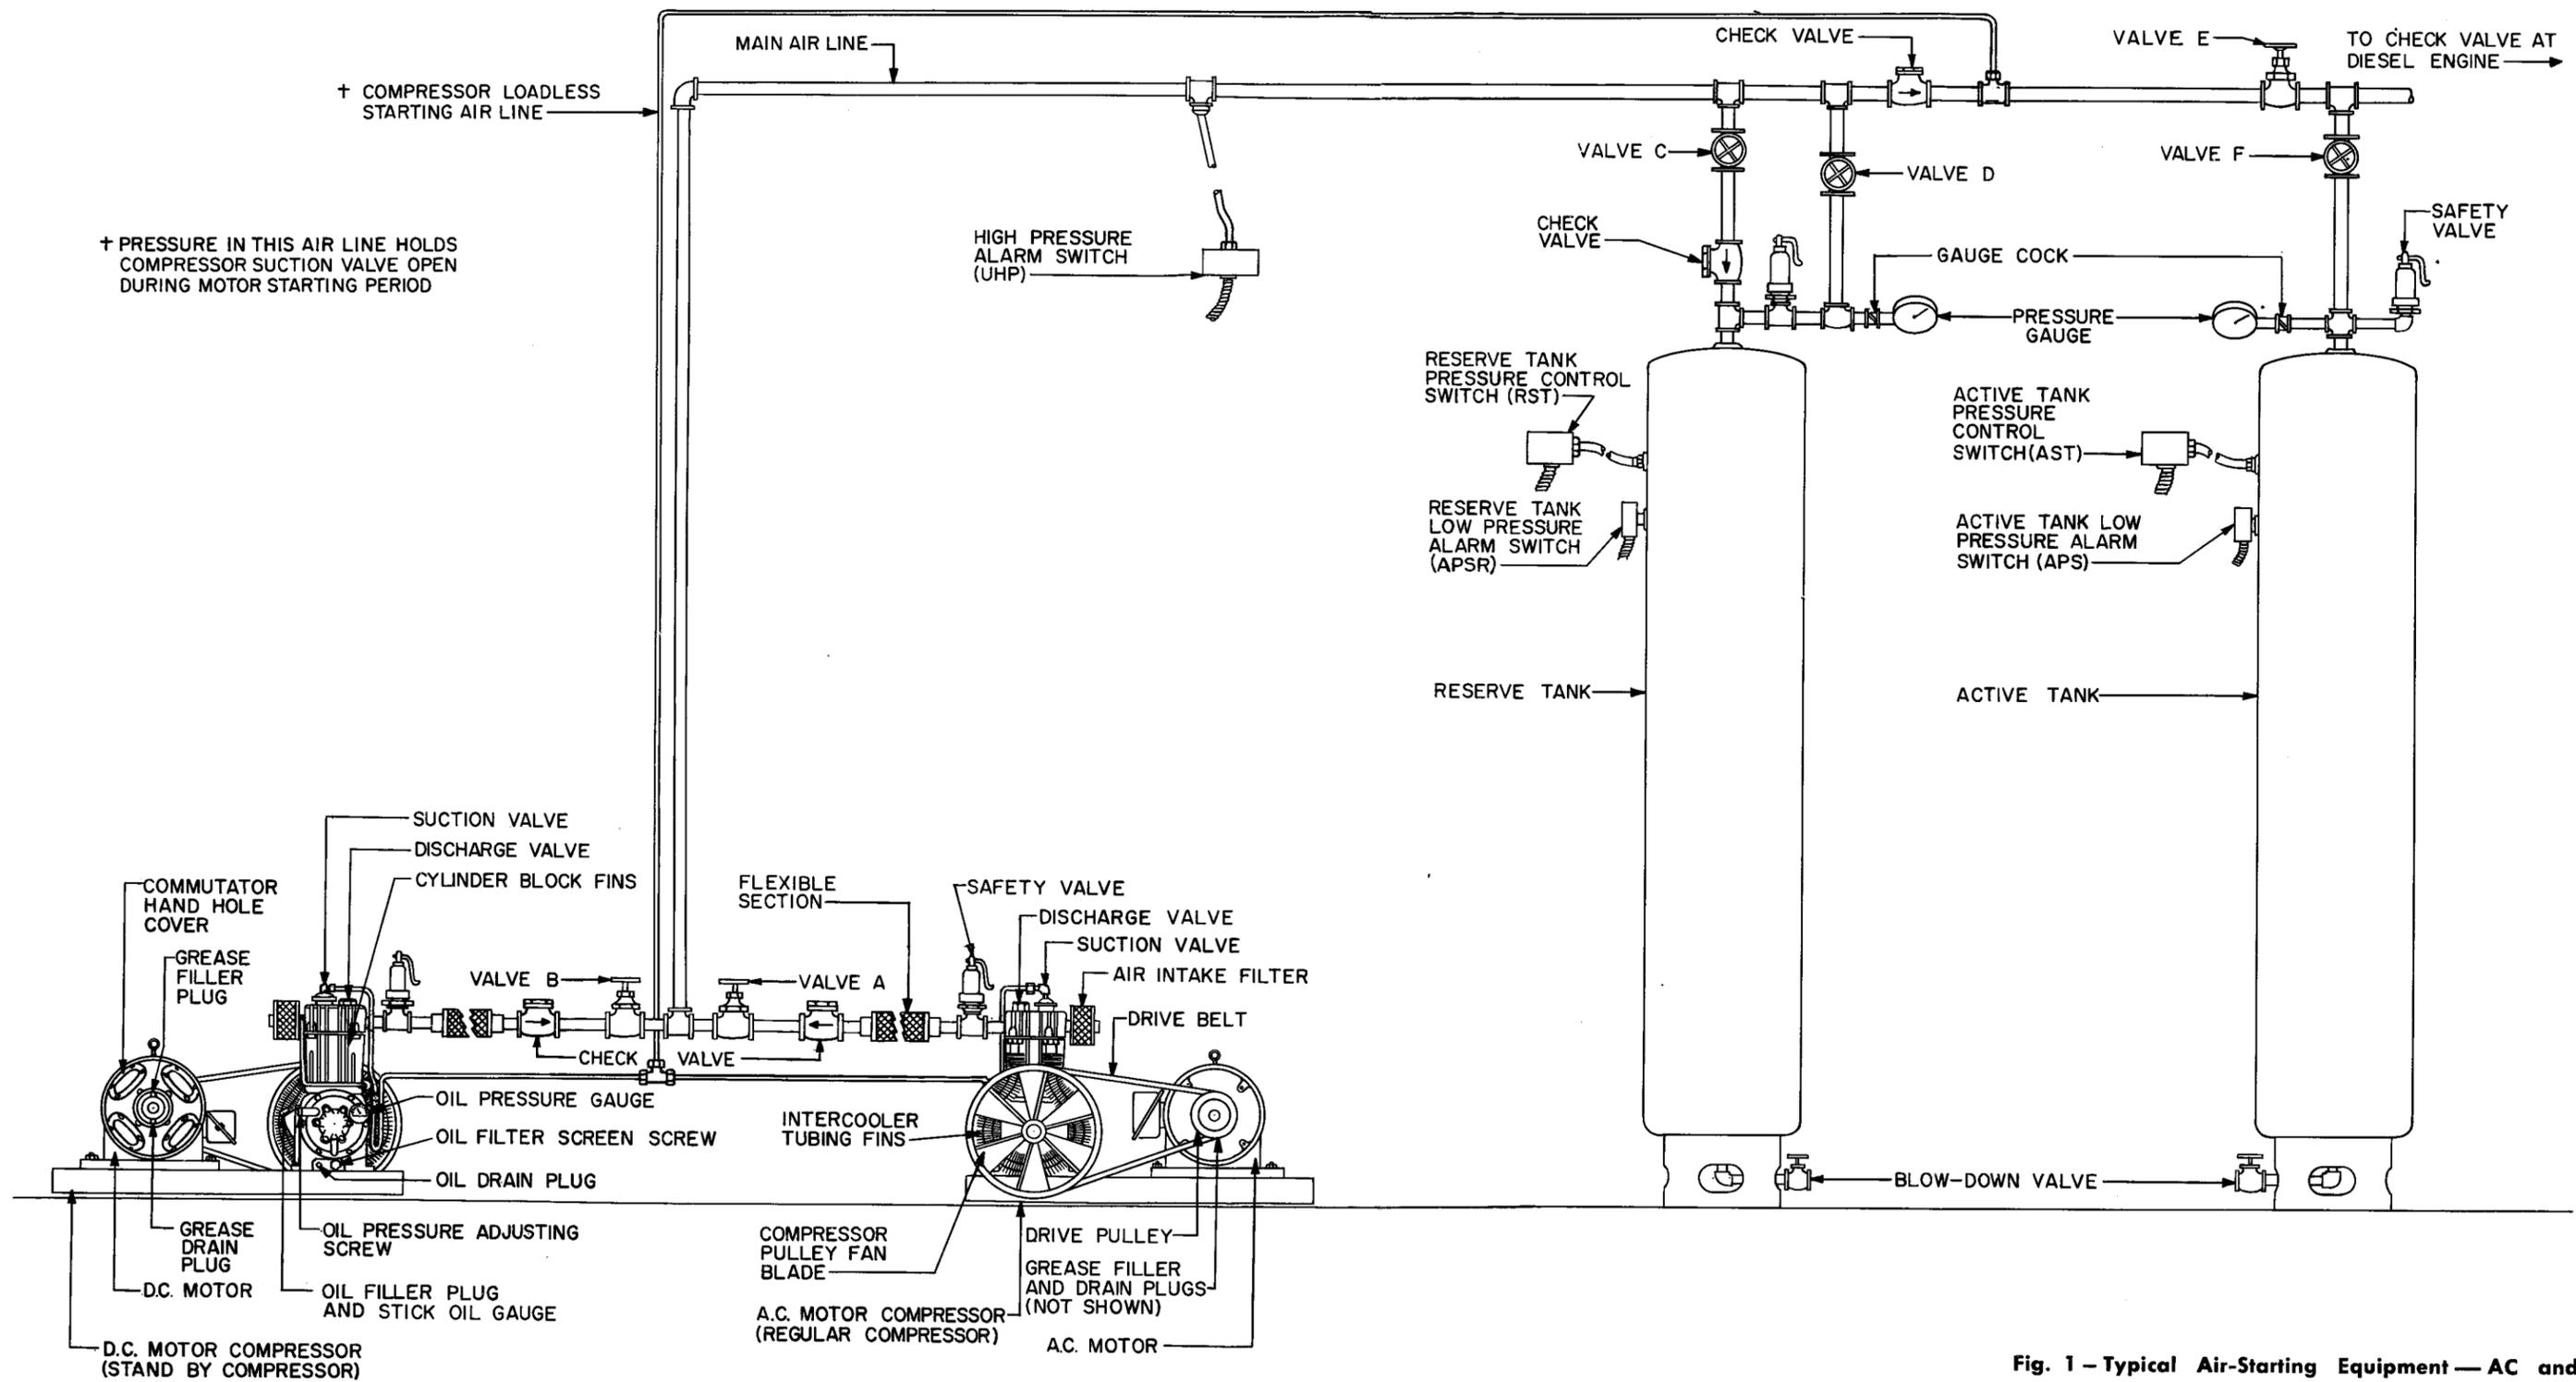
Typical Air-Starting Equipment - AC and DC Motor Air Compressors and Associated Tanks (KS-15777, L51 air-starting equipment shown)
